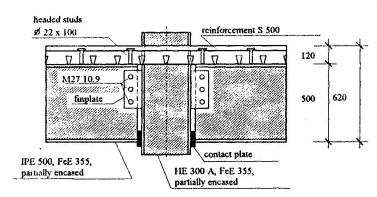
Tests with composite joints with finplate connection: joint detailing
